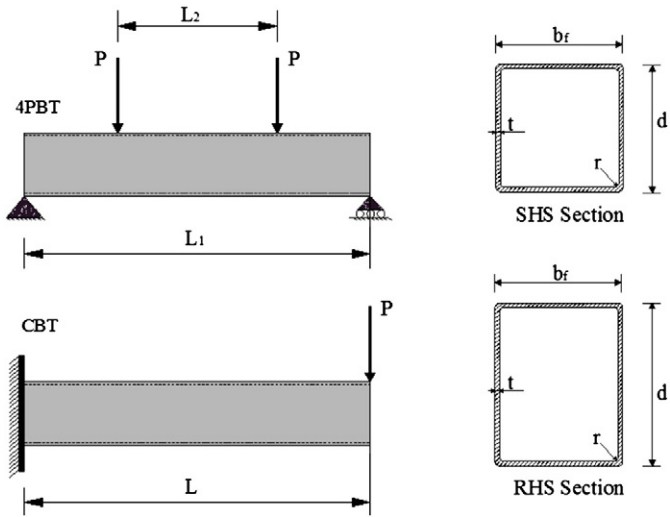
Schematic views of the test arrangement and geometry of cross-section variables for RHS-SHS steel beams.
